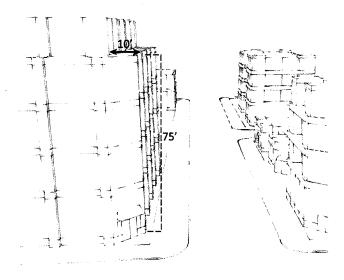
Upper Story Stepback For building facades over 75' in height that face a street or public space, any portion of the facade over 75' in height must step back at least 10.'
